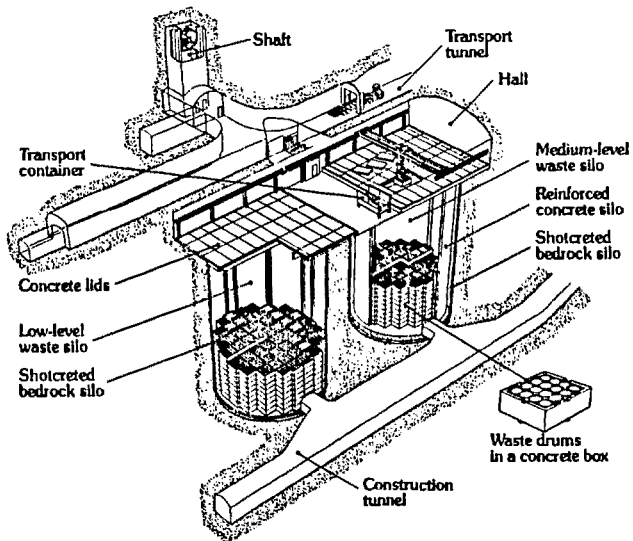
The final repository for LLW/ILW at Olkiluoto is under construction in bedrock at the plant site. Waste drums will be employed in the two silos at a depth of 70-100 m.
